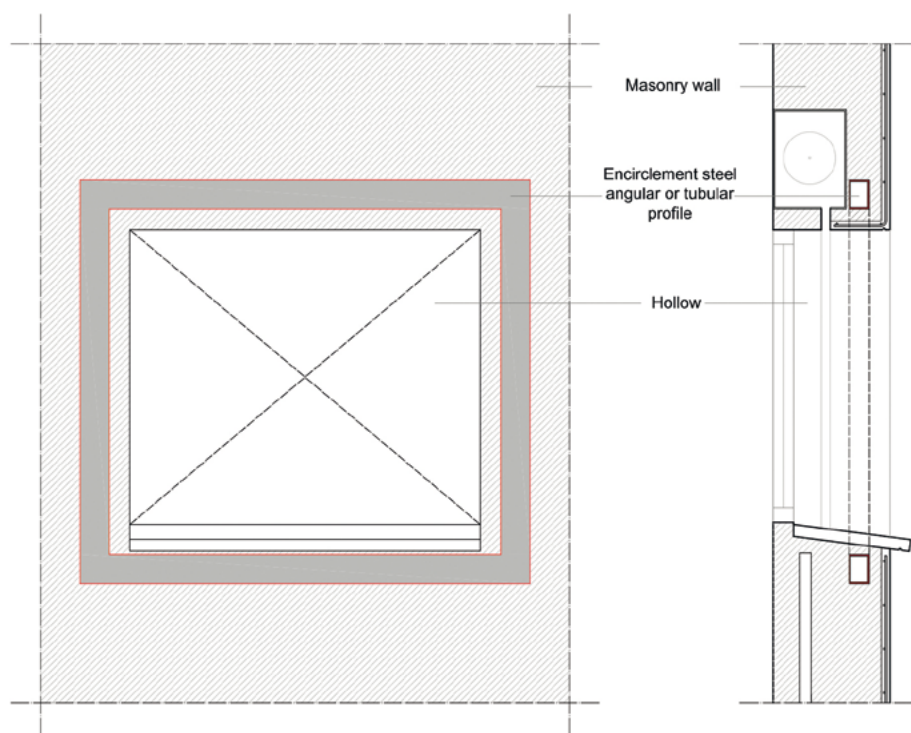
Steel rebar in opening perimeter. Elevation and cross-section.
